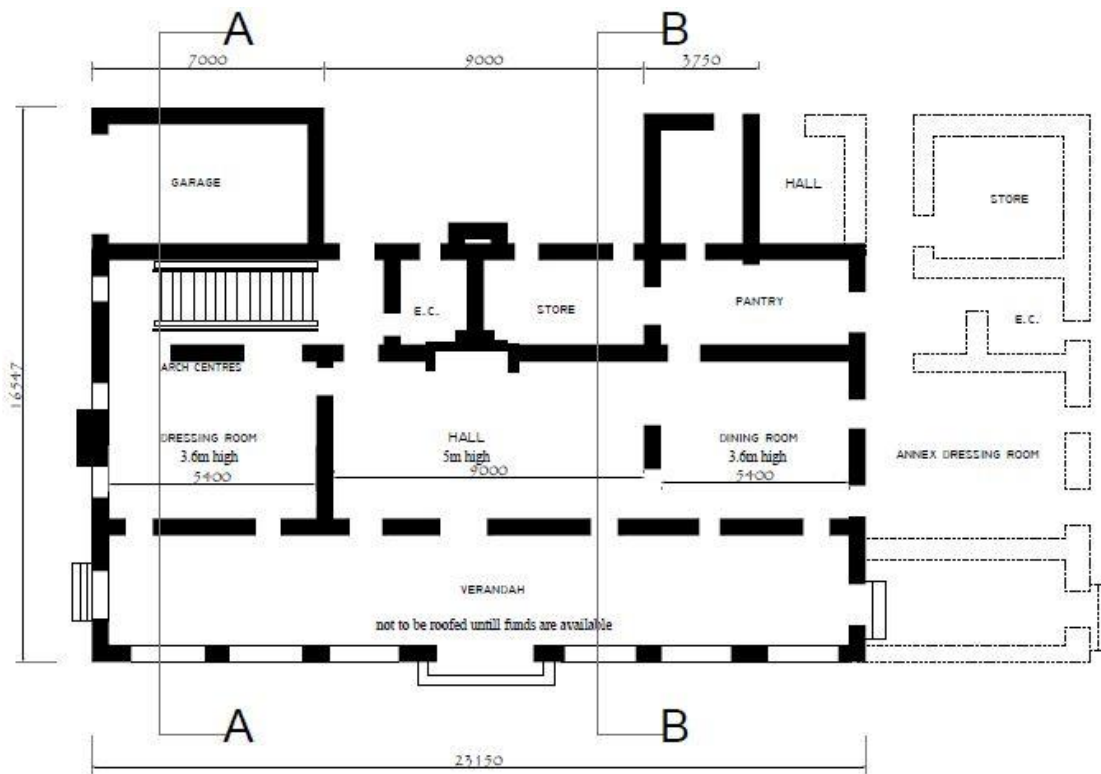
1929 drawing of European quarters adapted to the Hausa house form, Katsina (Ground floor plan)<sup>395</sup>
